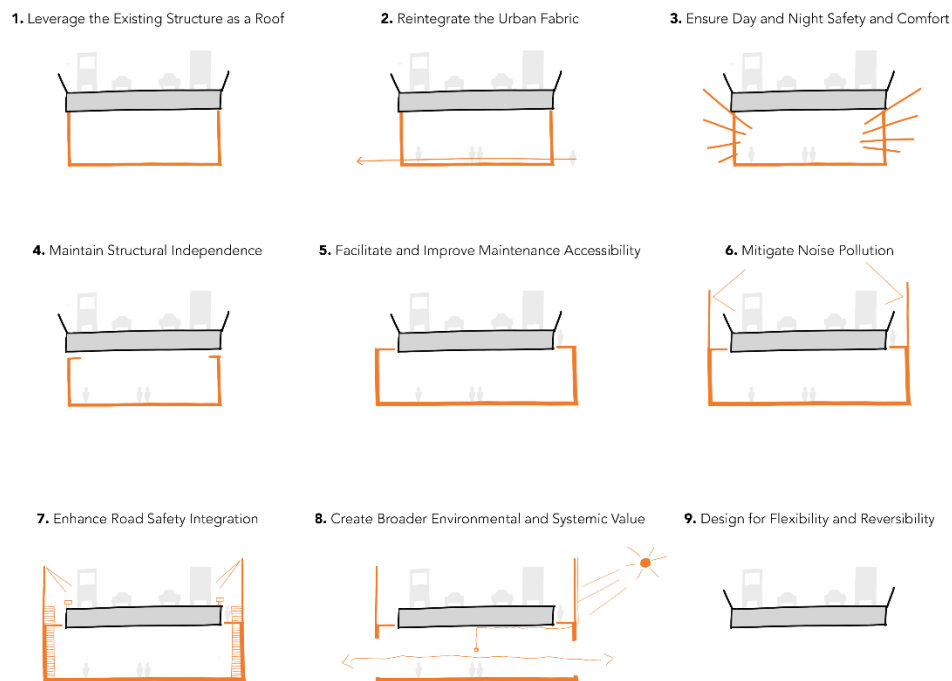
9 Design guidelines for reactivating spaces beneath bridge and roof-like structures.
